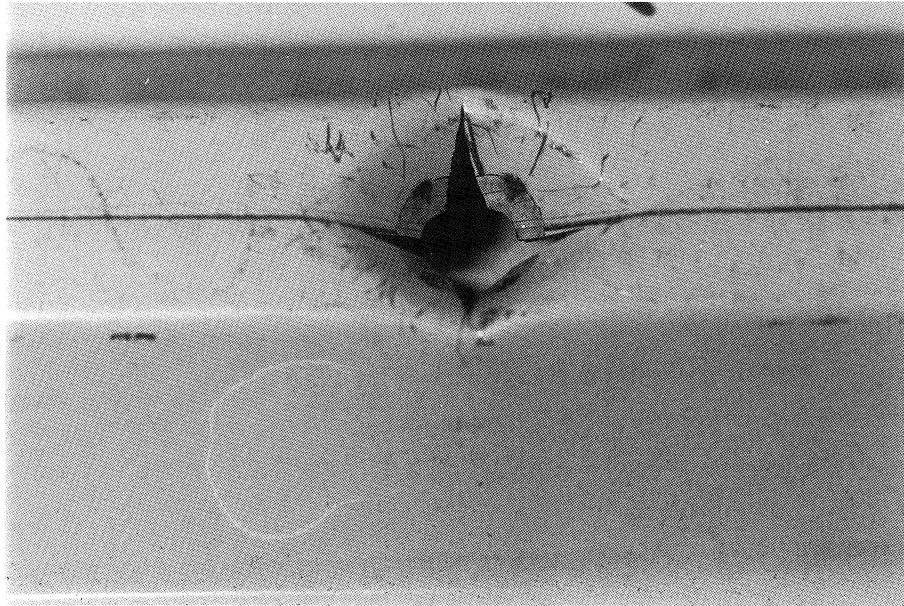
Cracks Observed during TR440 Tests on Trapezoidal Roofing
